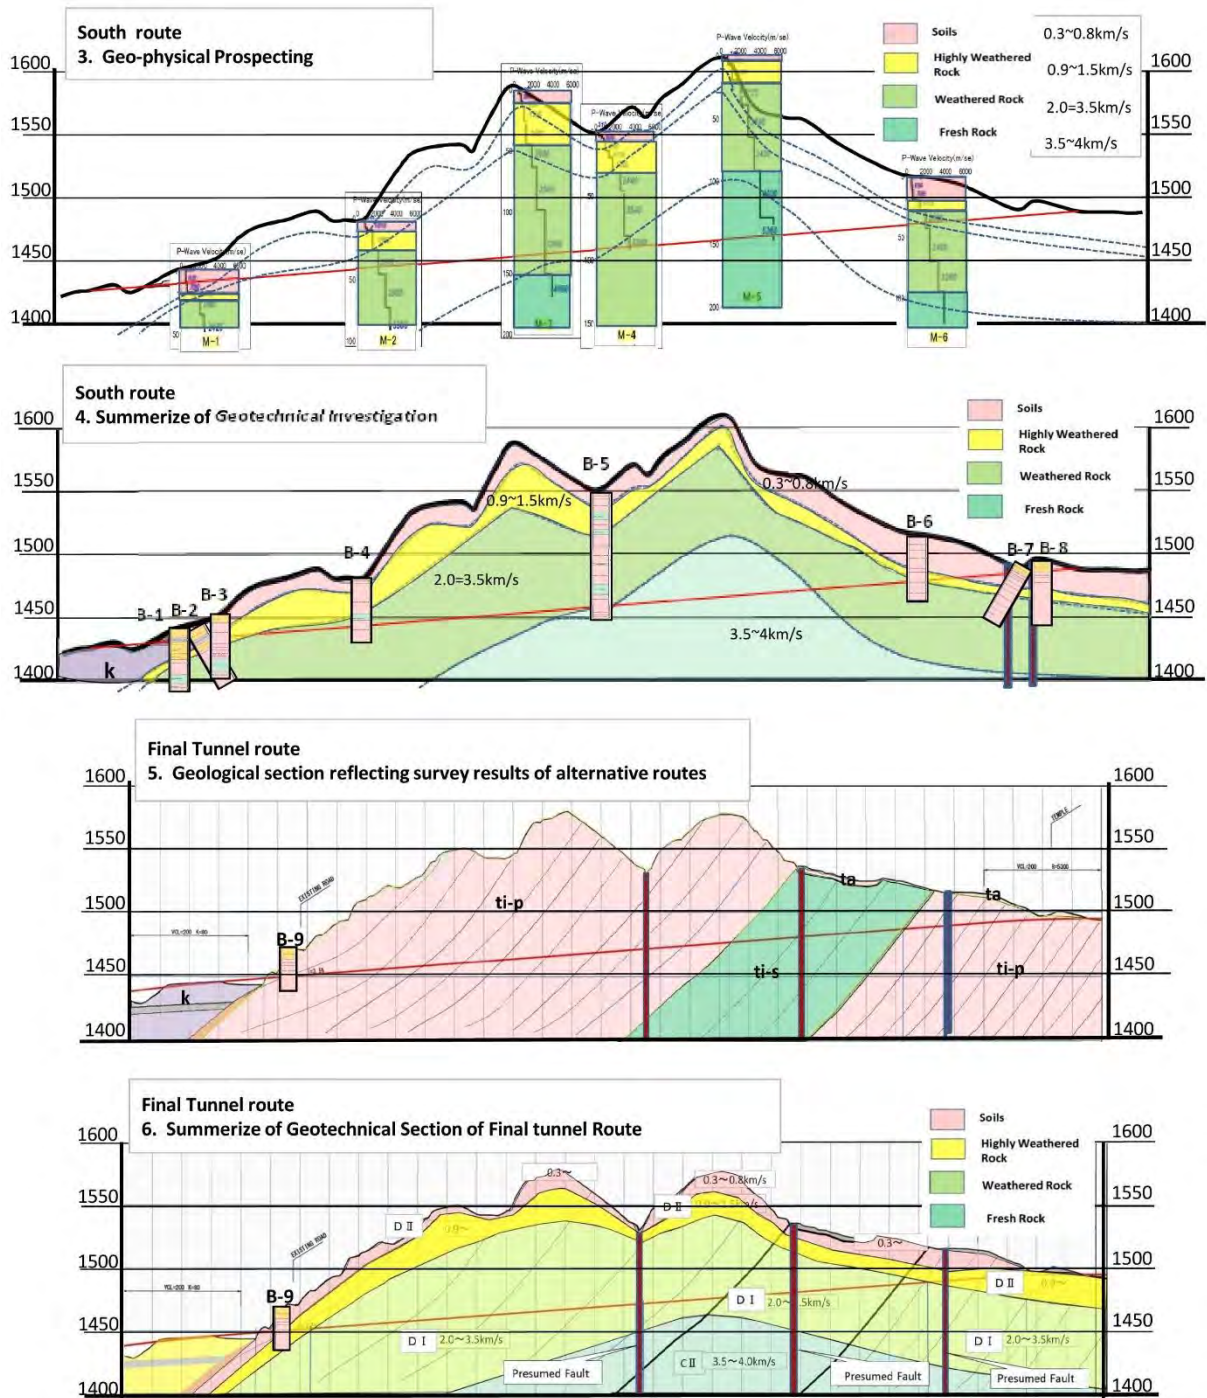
Relationship between Comparative Section and Planned Tunnel Cross Section
